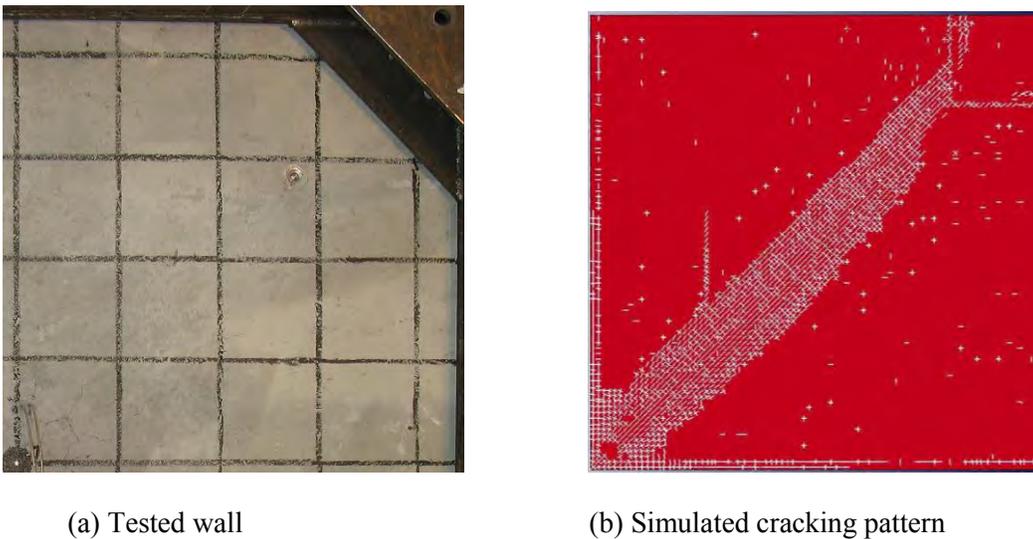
Failure pattern on back face of the concrete wall.
